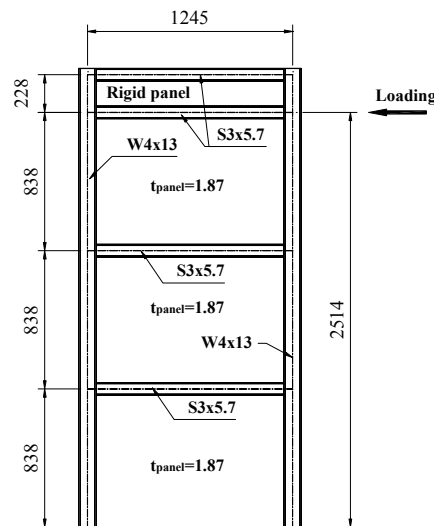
Shear Wall Specimen M14 Tested by Chen (dimensions are in mm)
